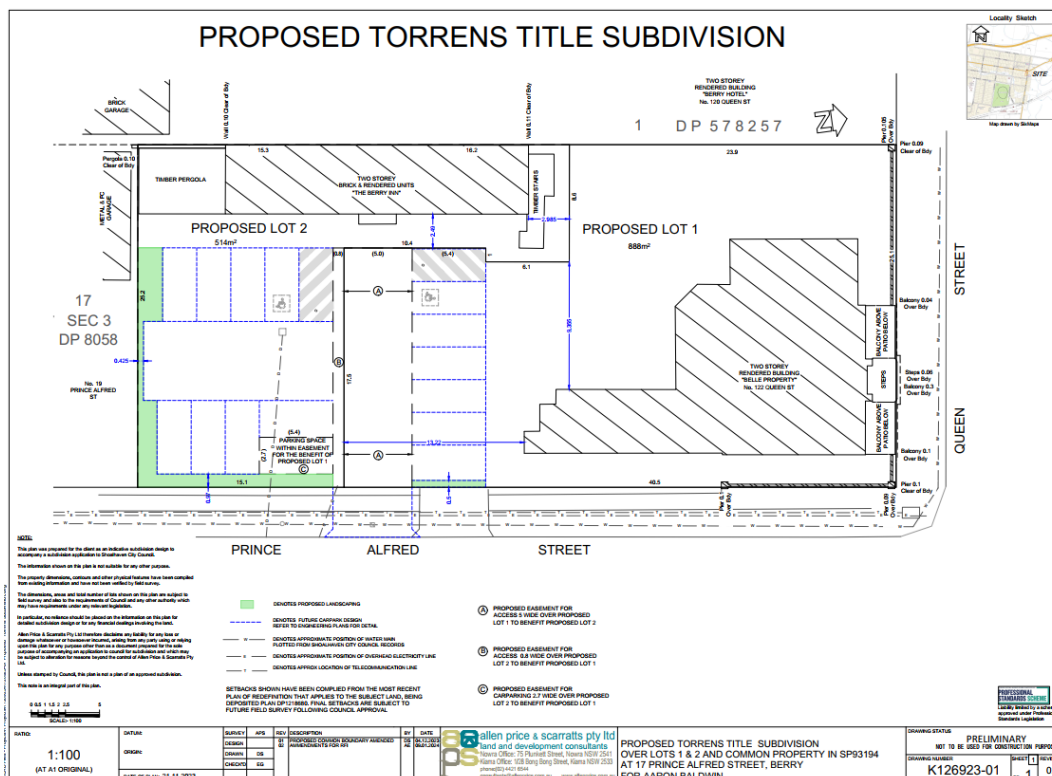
Approved Subdivision Sketch plan (Source: APS)
